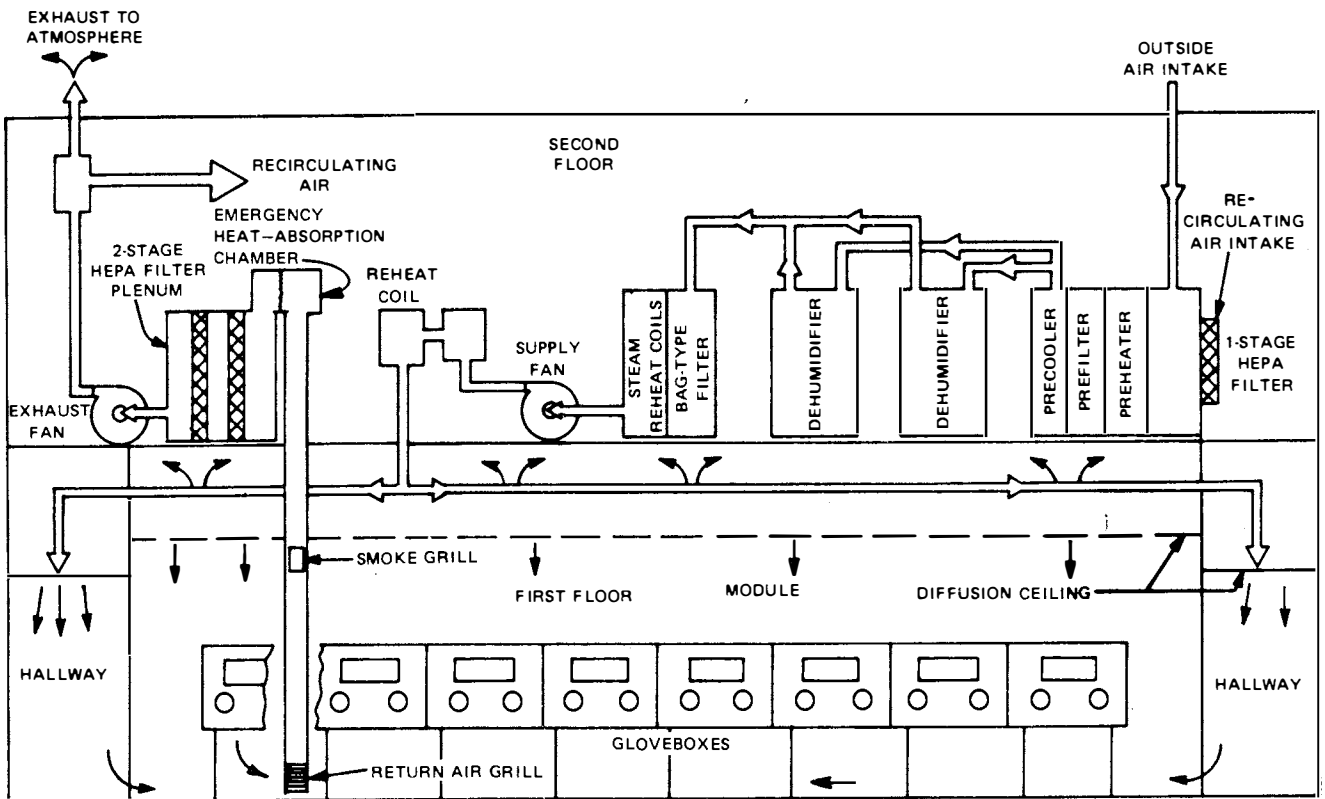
Typical Building Dry Air Ventilation System
